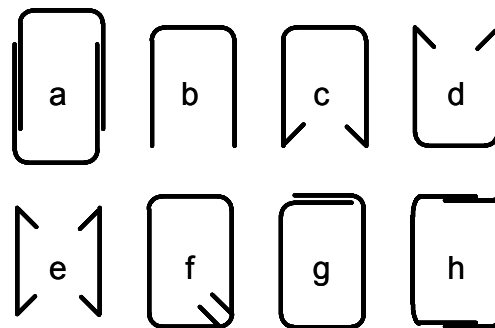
Stirrup configurations used by Anderson and Ramirez (1989)
